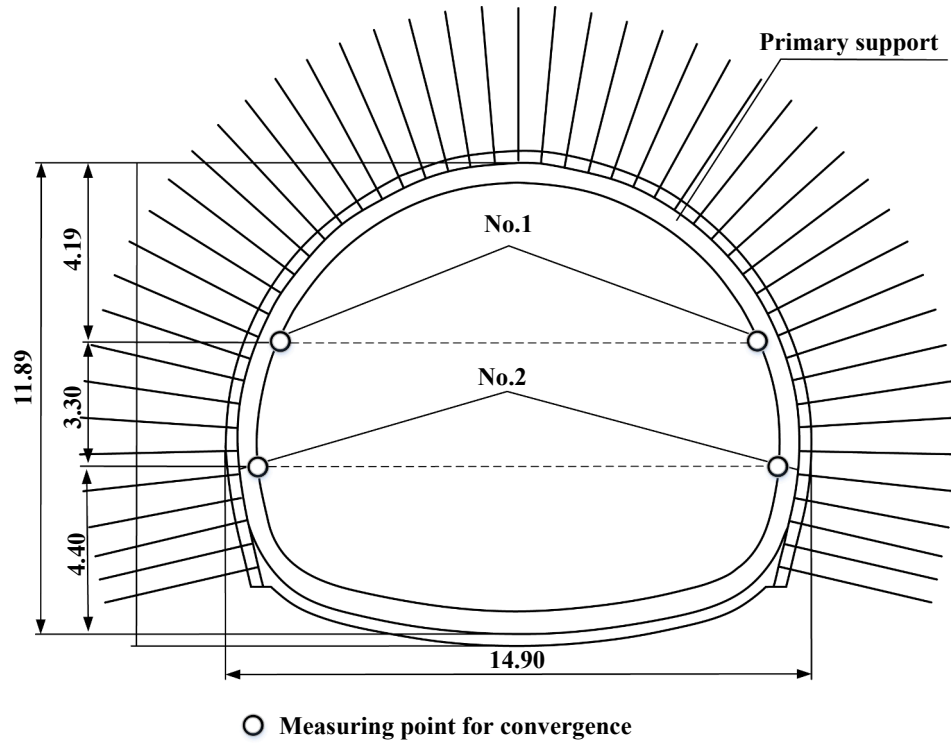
A typical cross-section of the Yangshan tunnel (Unit: m).
